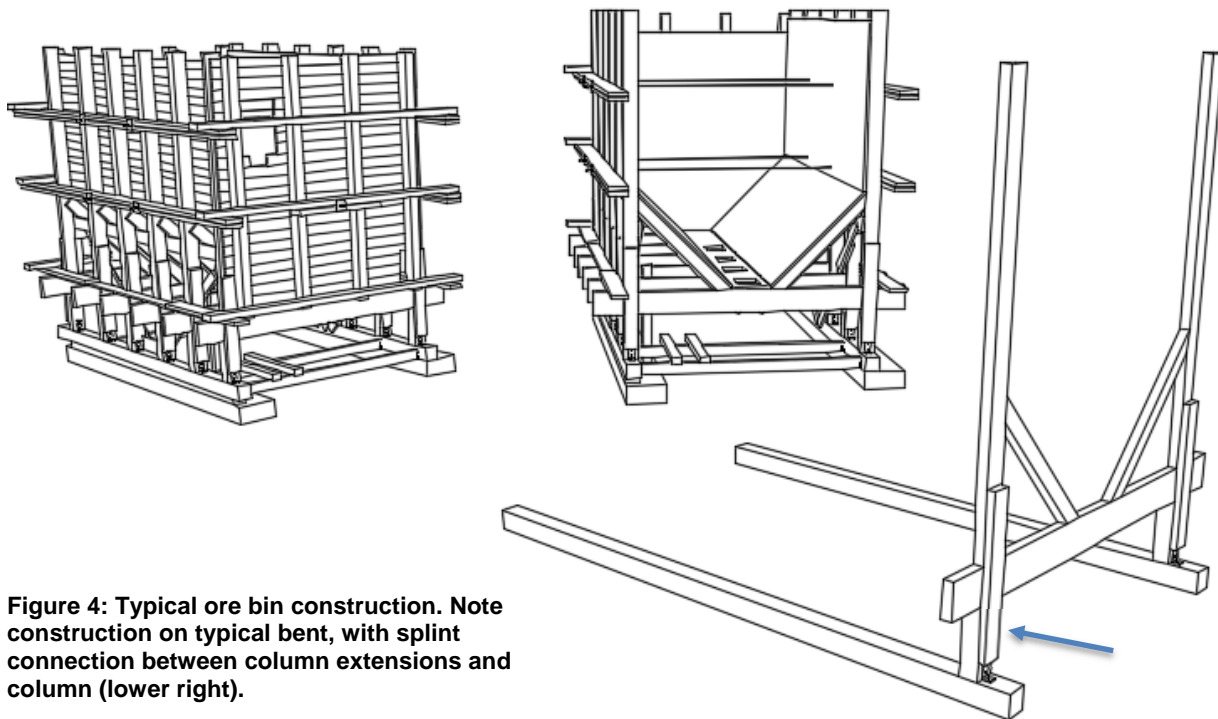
Typical ore bin construction. Note construction on typical bent, with splint connection between column extensions and column (lower right).
